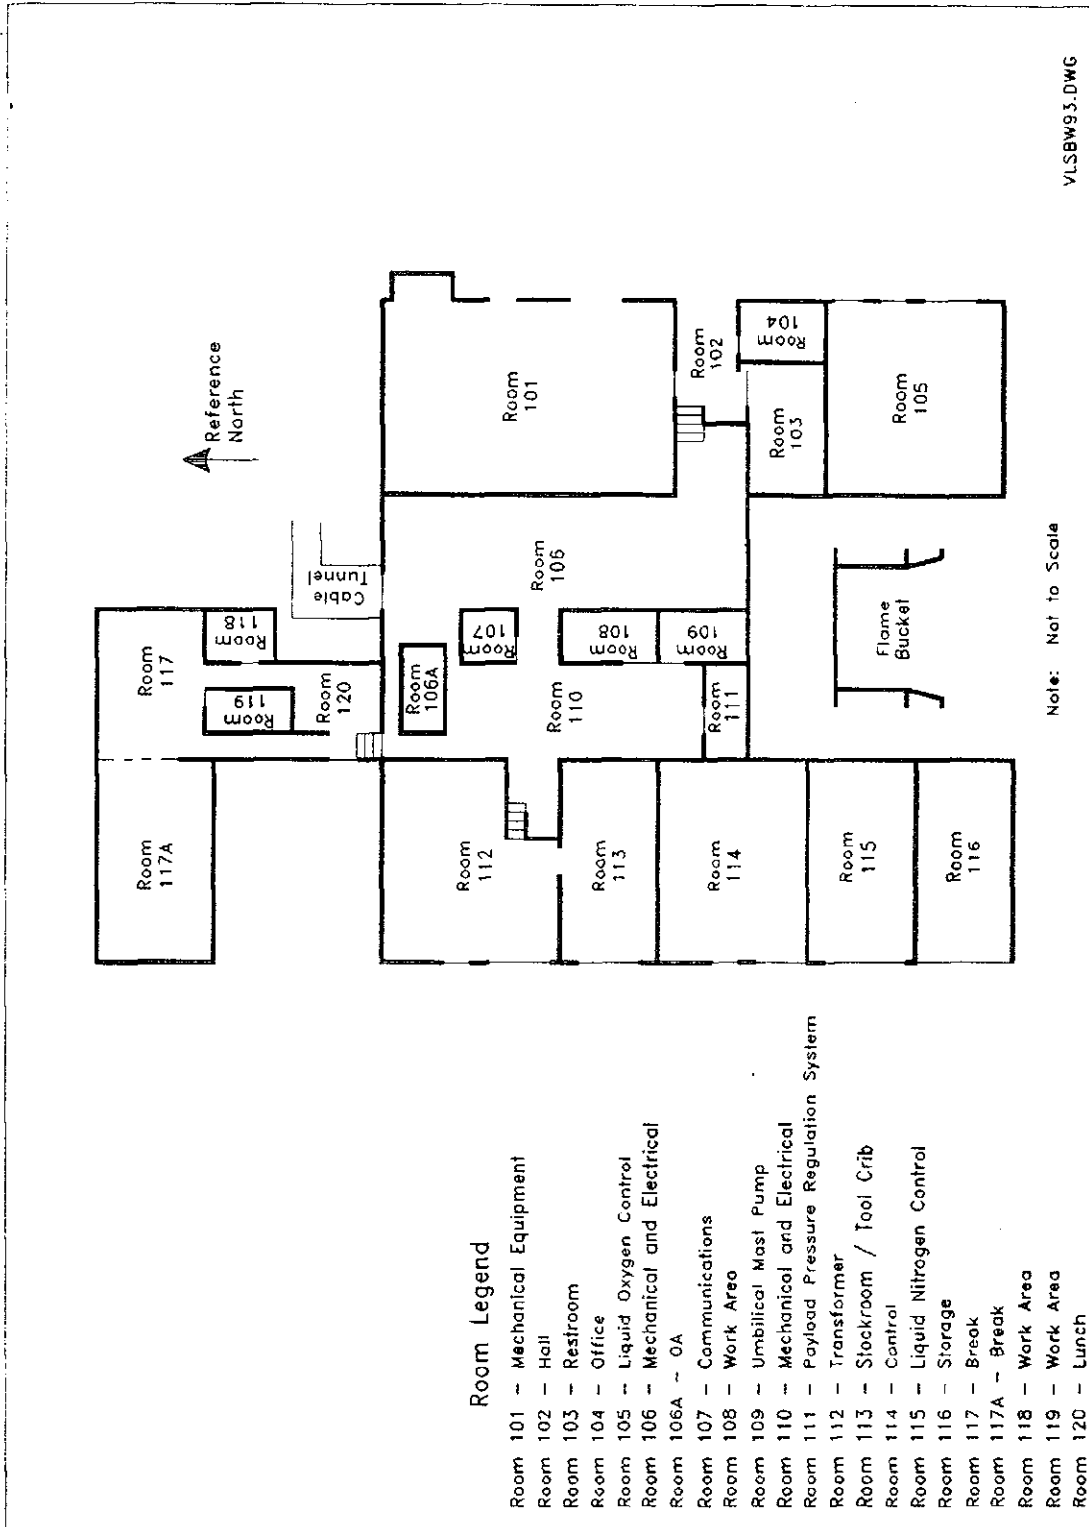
Current floor plan of SLC-3W LSB (Bldg. 770)
